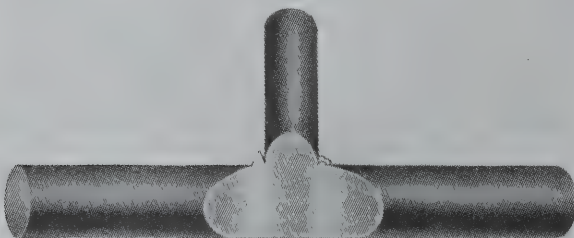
CUT THROUGH WELD OF B.R.C. FABRIC.
